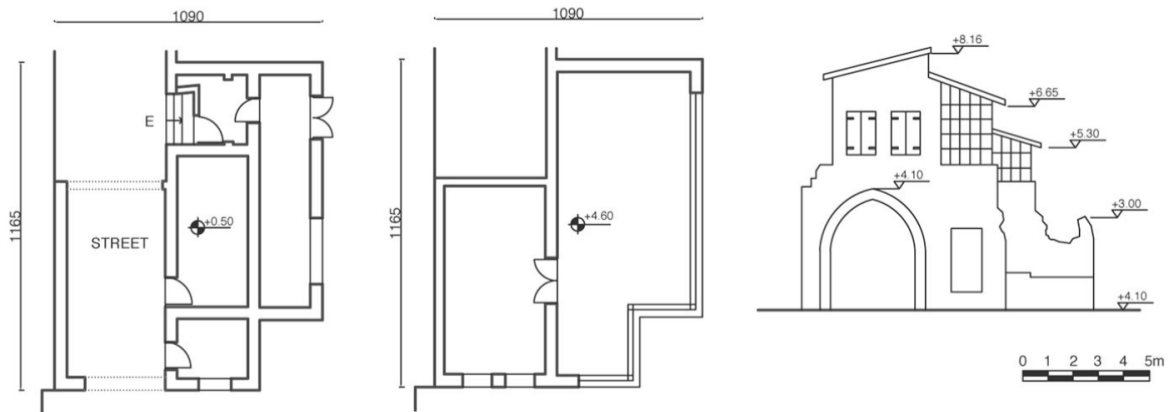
Ground floor, first floor plans and south elevation of the arched house before restoration (Drawn by)
